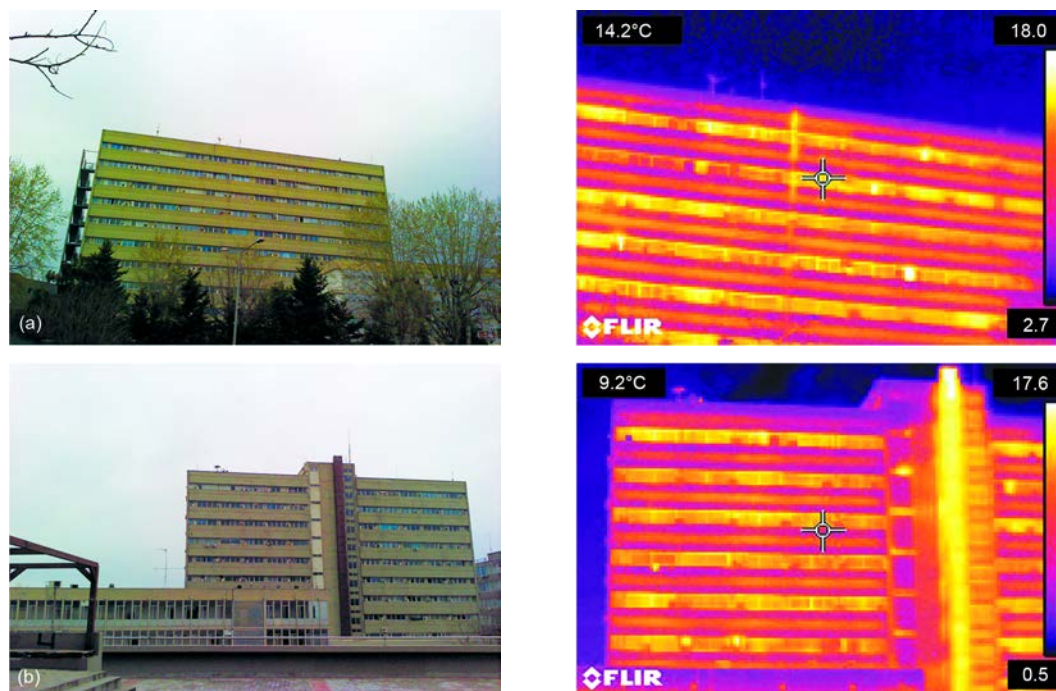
(a) South-west façade, (b) north-east façade (for color image see journal web-site)
